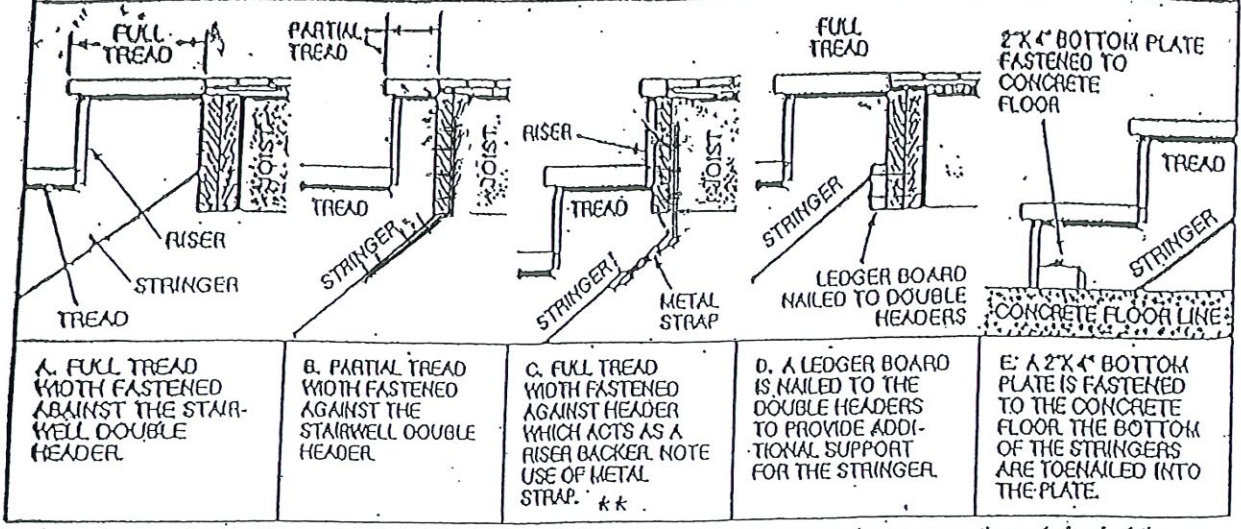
Some methods of fastening stair stringers. Fastening must be secure since stringers carry the main load of the stairway.
